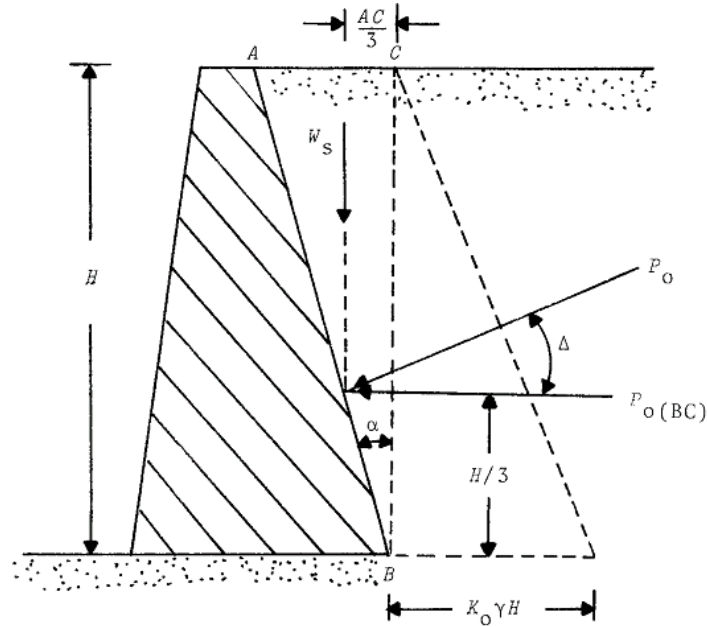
At-rest force for a retaining wall with an inclined back face.
